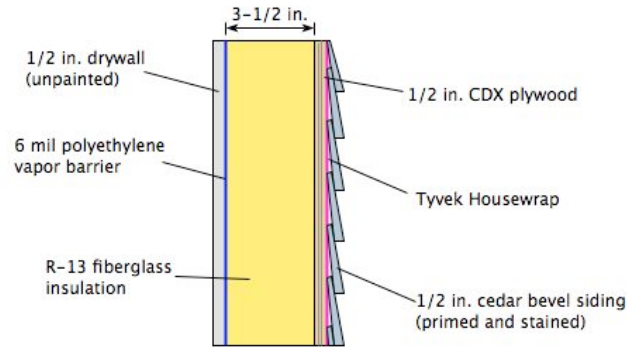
Cross-sectional view of the wall section constructed for the THz attenuation study.
